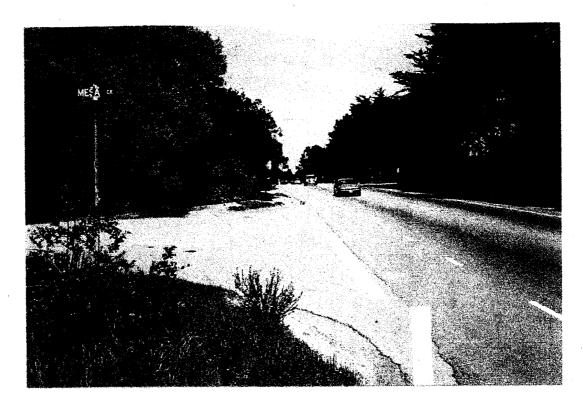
Southbound Highway 1 at Mesa Drive - view looking north.
